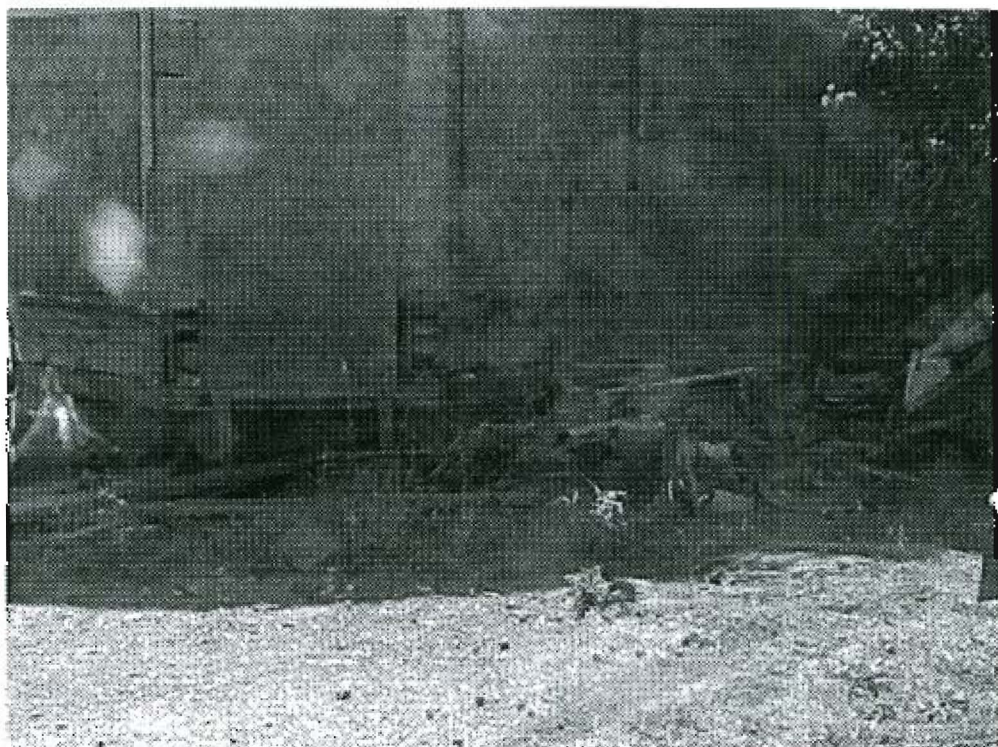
View of underneath existing dwelling with remains of lead pipe and cast iron drain pipe.
